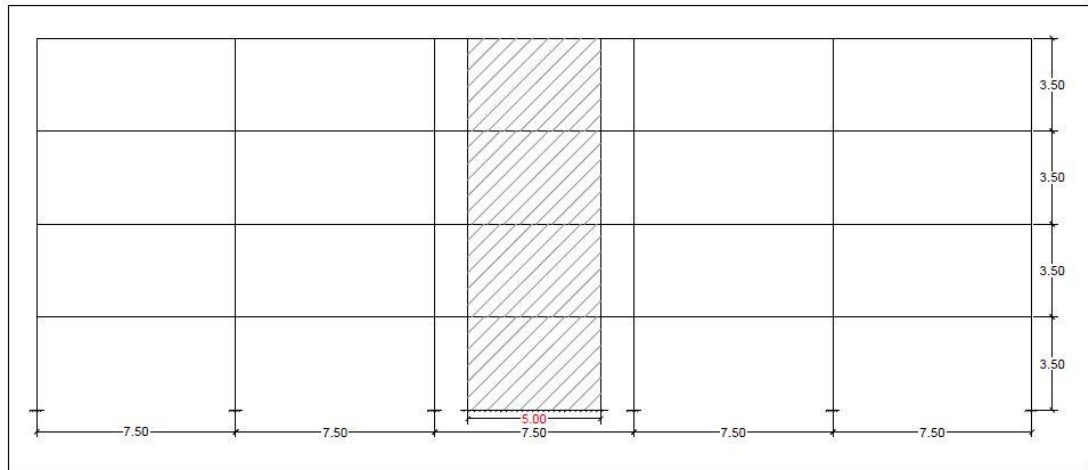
Elevation of 4-story building with steel plate shear walls having aspect ratio of 1.430 (Model 4)
